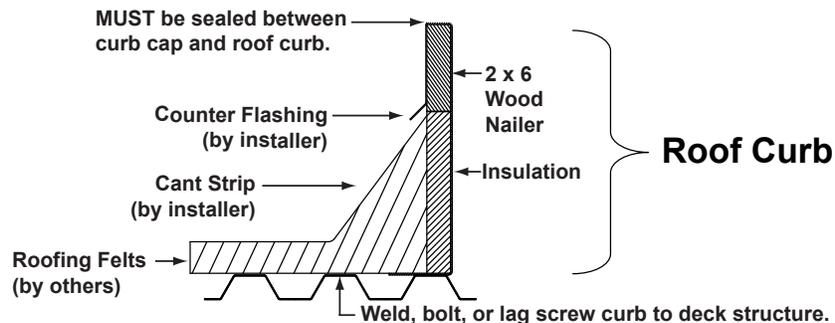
Cross-Section of Roof Curb Showing Construction Detail
